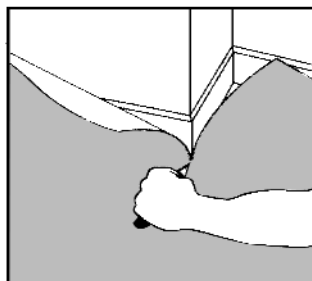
Inside Corners: Diagonal cutoffs are made at inside corners until the material falls into place in the corner angles.
